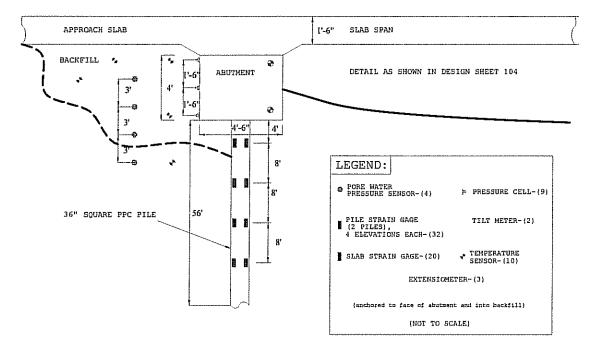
Instrumentation Plan for Caminada Bay Bridge –Substructure (Bent 1, LADOTD Design Sheets 104 and 147)
